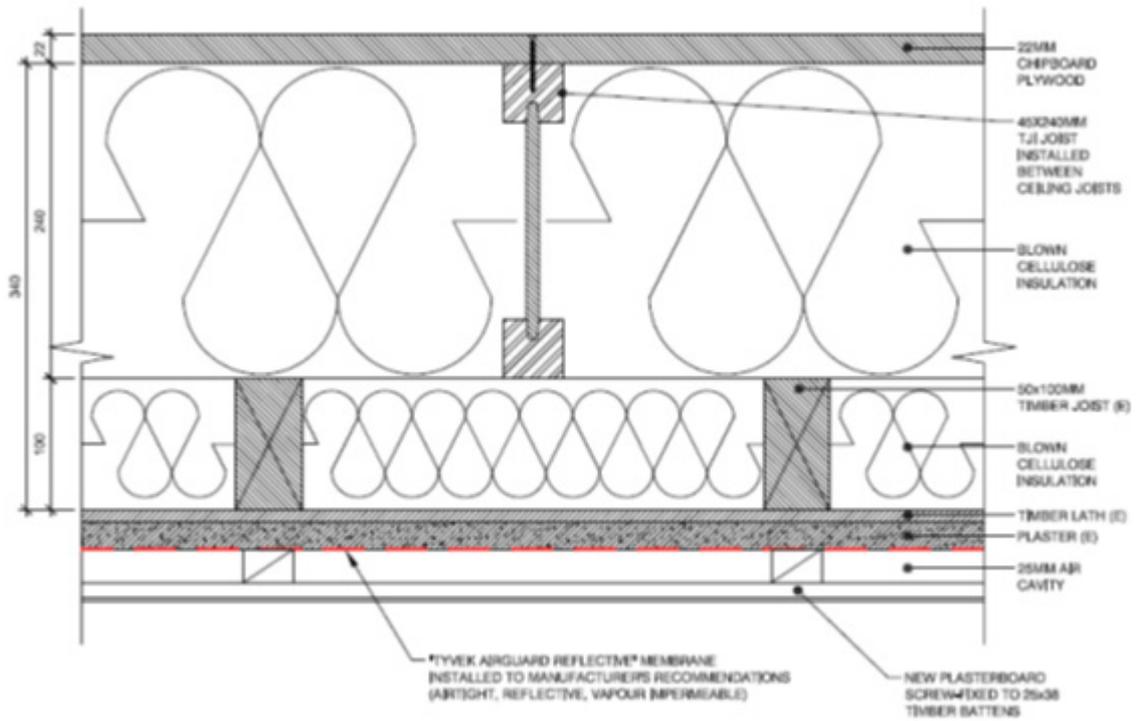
Attic floor construction (copyright Arboreal Architecture)
